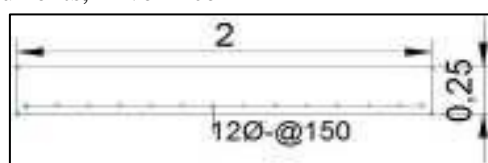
Reinforcement Details for One Panel Deck in Transverse Slab
